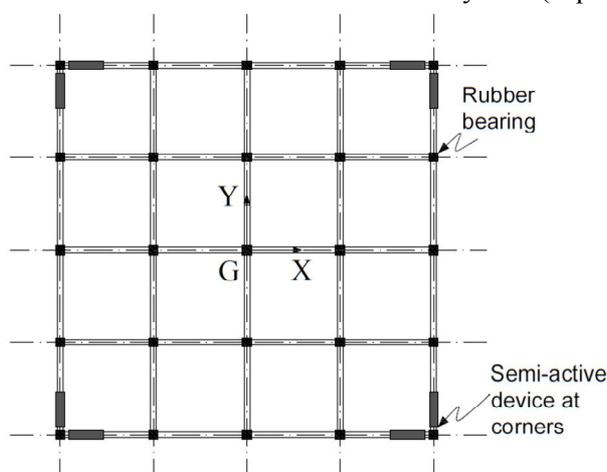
Plan view of benchmark 3-story semi-active isolated building.
